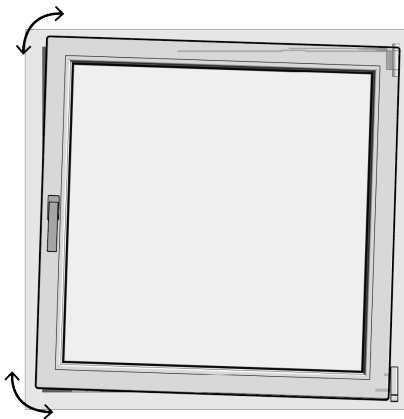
Bottom Hinge Side-to-Side adjustment, Sash movement shown is exaggerated for clarity.
